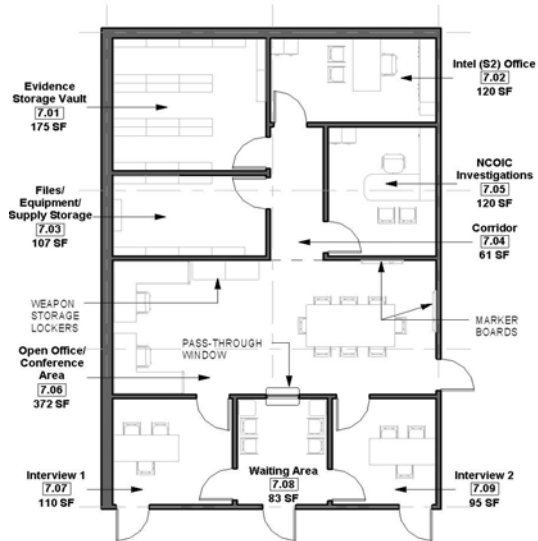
Module 7: Investigation/ S2 – Floor Plan
